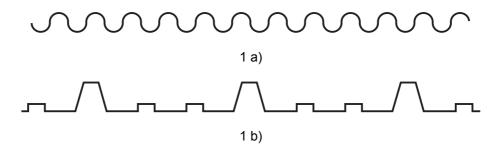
Illustration of typical profiled sheet (see 3.3.6)
